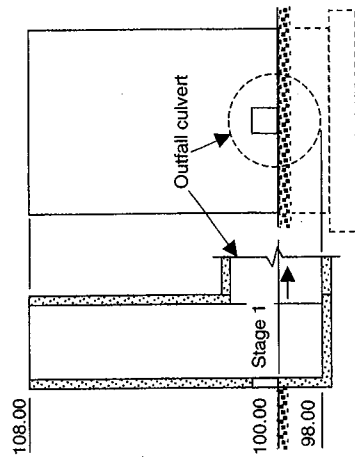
Riser box configuration for the outfall culvert and first stage in Example 12.5.
